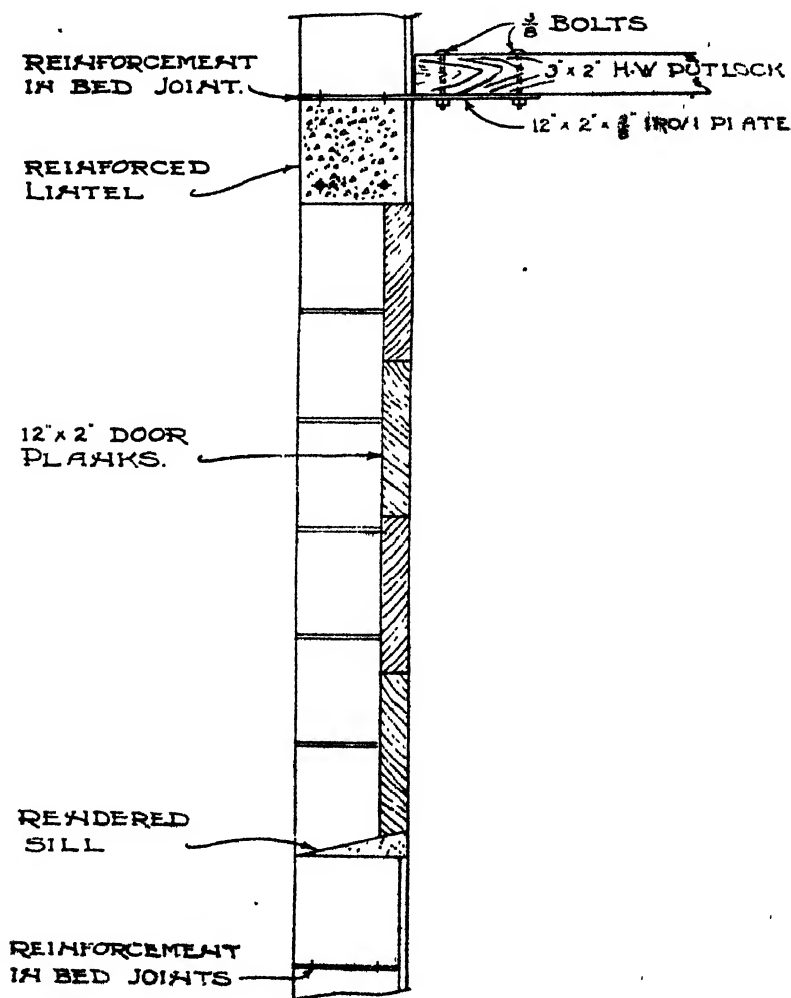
Detail Section of Doors of Concrete Block Sills.
